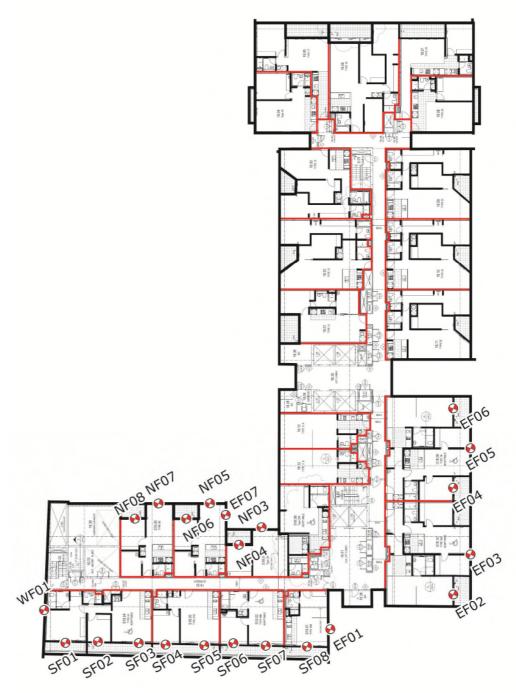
Opening Locations and Internal Apartment Layout - Level 18
